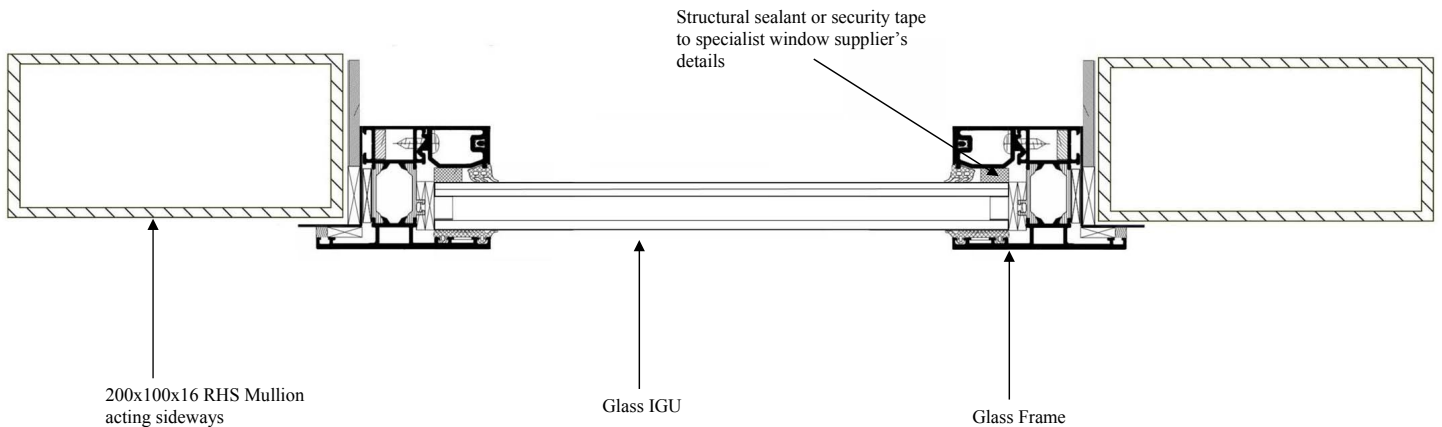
proprietary window frames fixed into opening formed by steel RHS mullions. Vertical section would look similar, only with 100x100x4mm RHS's
